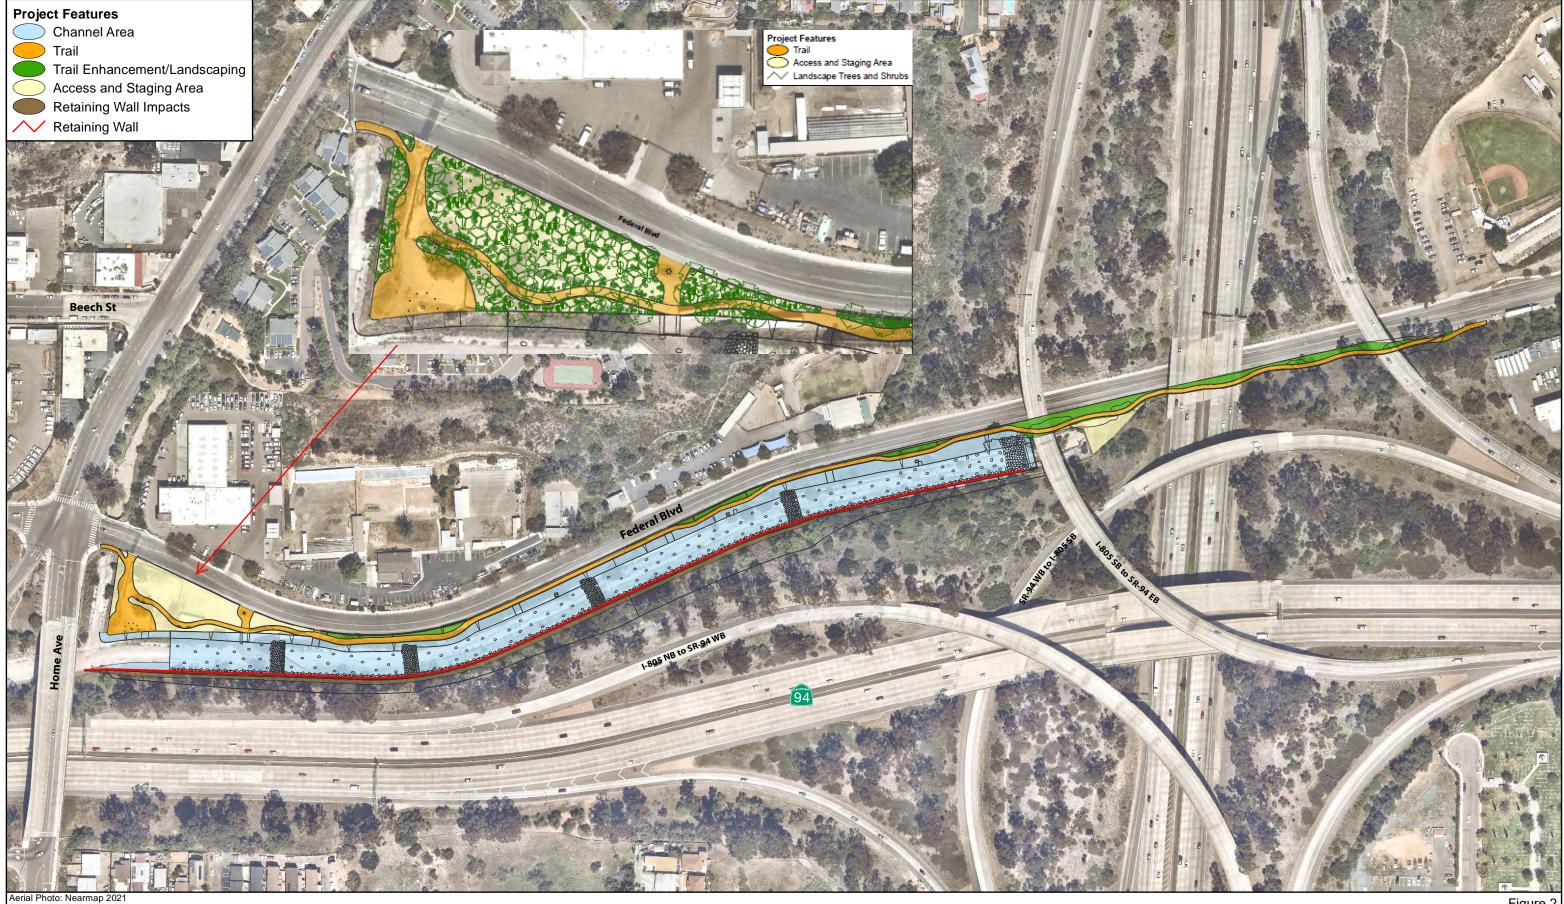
Site Plan Federal Boulevard De-Channelization & Trail Project
